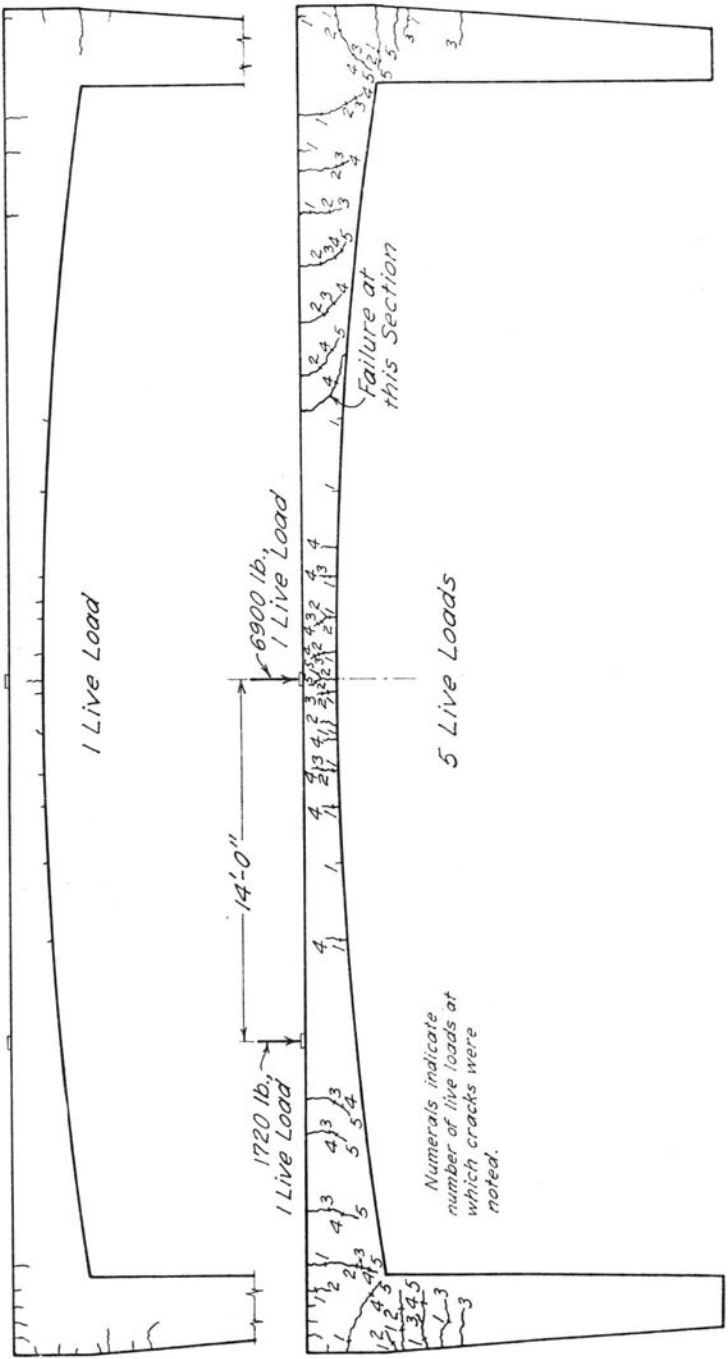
CRACKS OBSERVED DURING CAPACITY TEST; SPECIMEN 1
